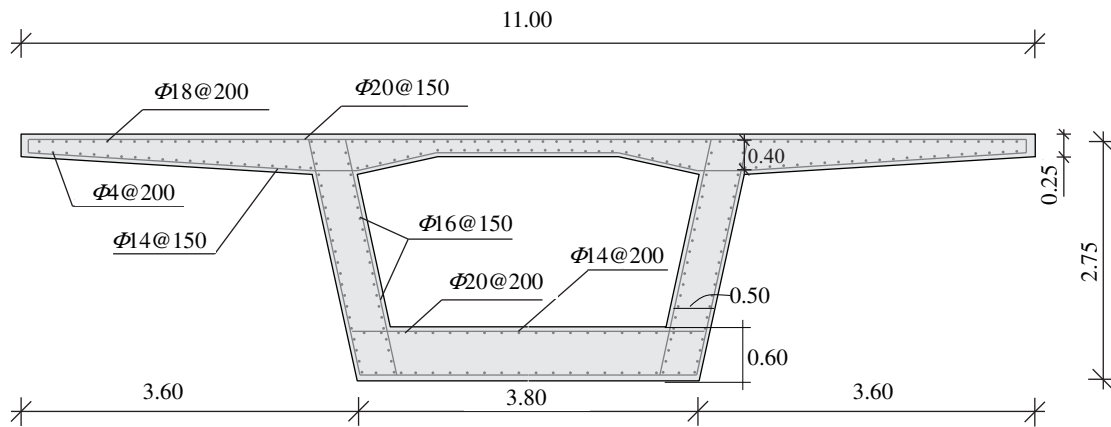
Transverse cross-section and reinforcement layout (dimensions in meters)
